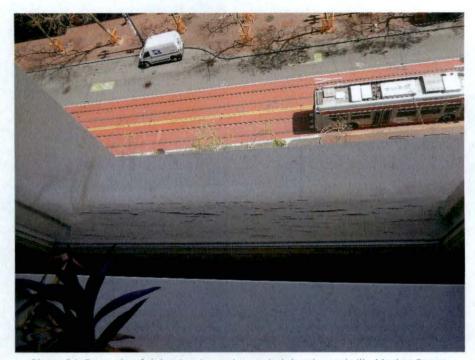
Example of delaminating paint at sixth level wood sill - Market Street.
